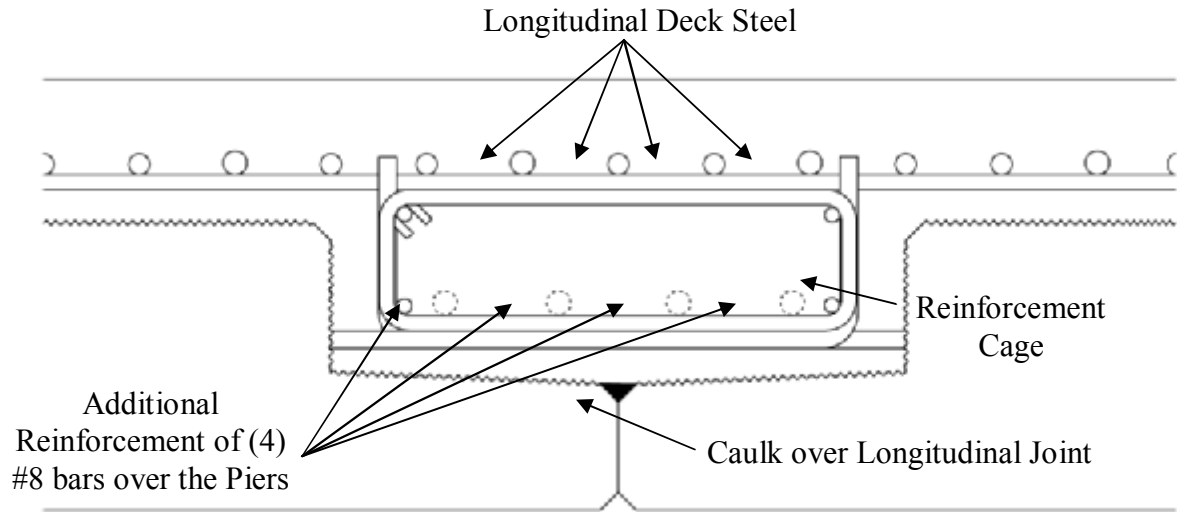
Cross-sectional view of the precast longitudinal joint detail
